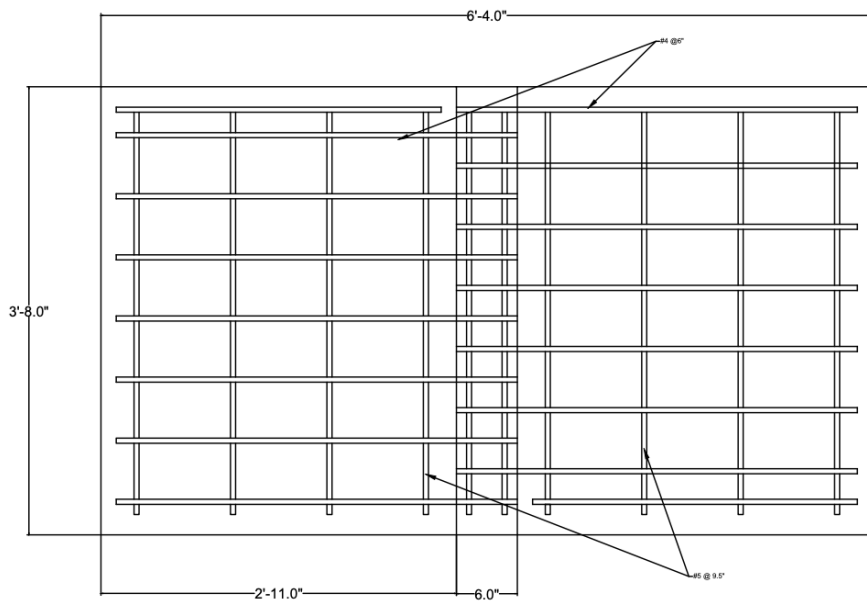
Plan view of test specimen 2 (6 in. closure gap)
